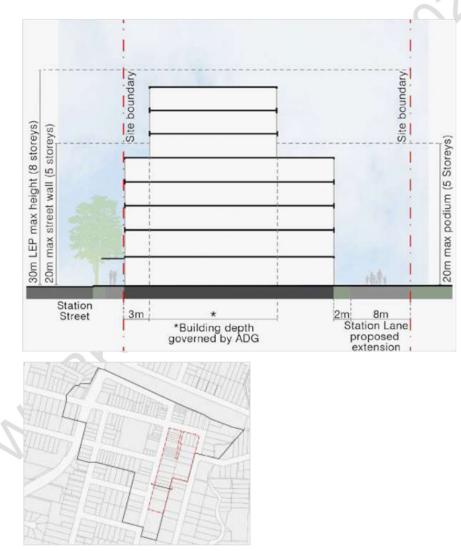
Station Street East/Lane Street Precinct – Typical East West Section
